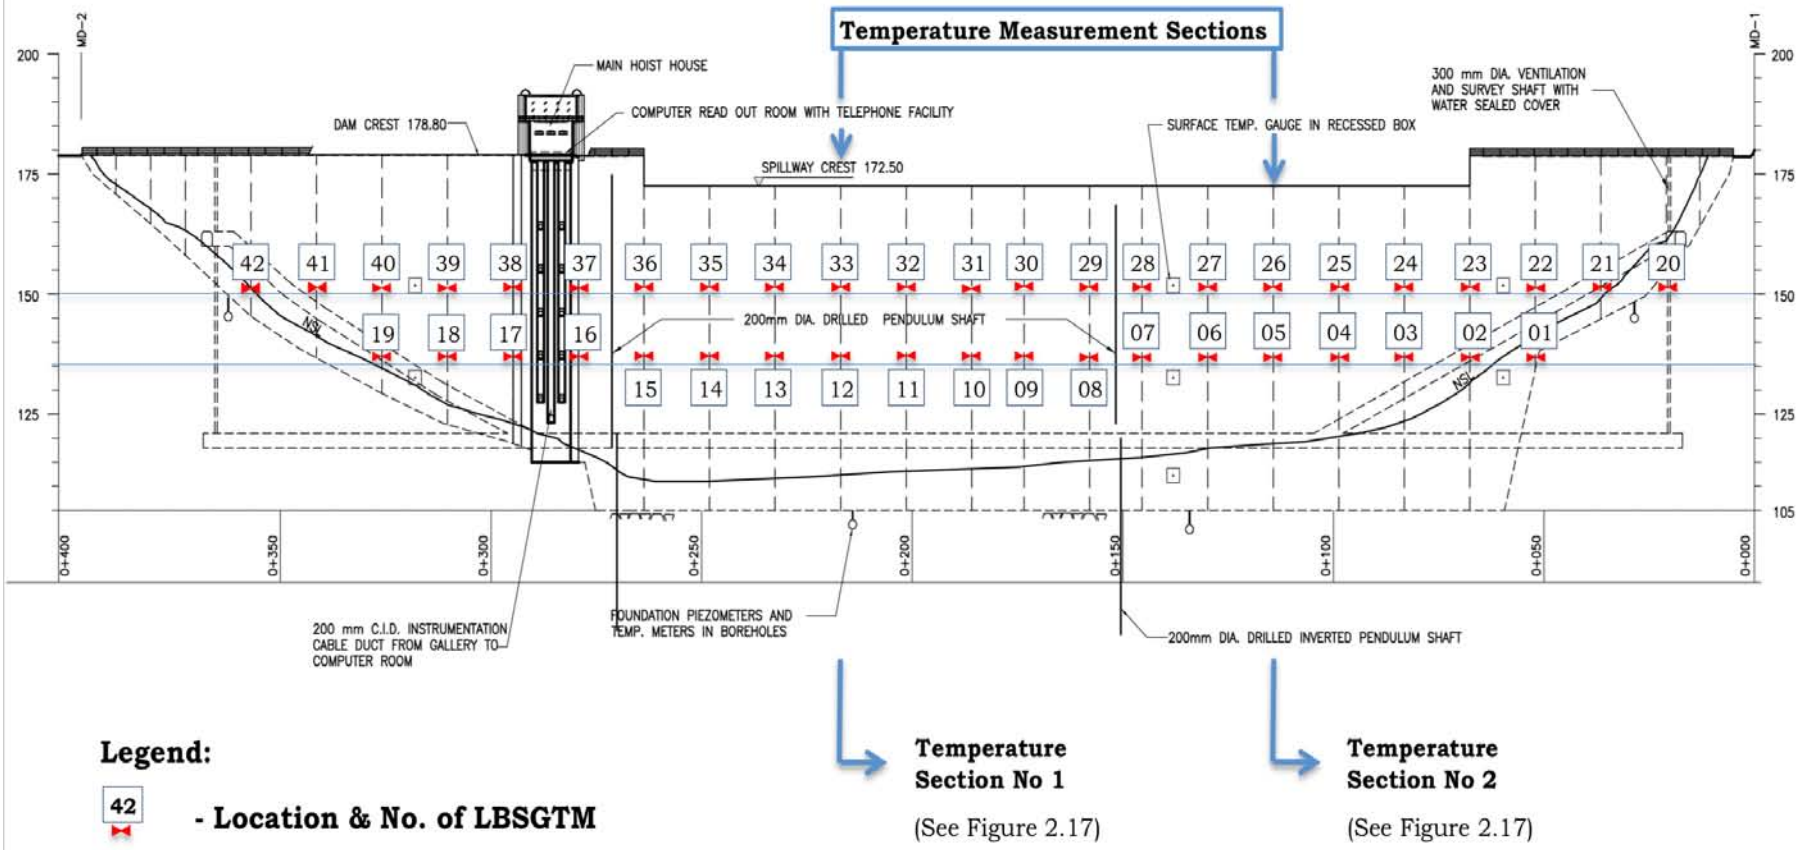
Thermal Instrumentation (Upstream Elevation)
